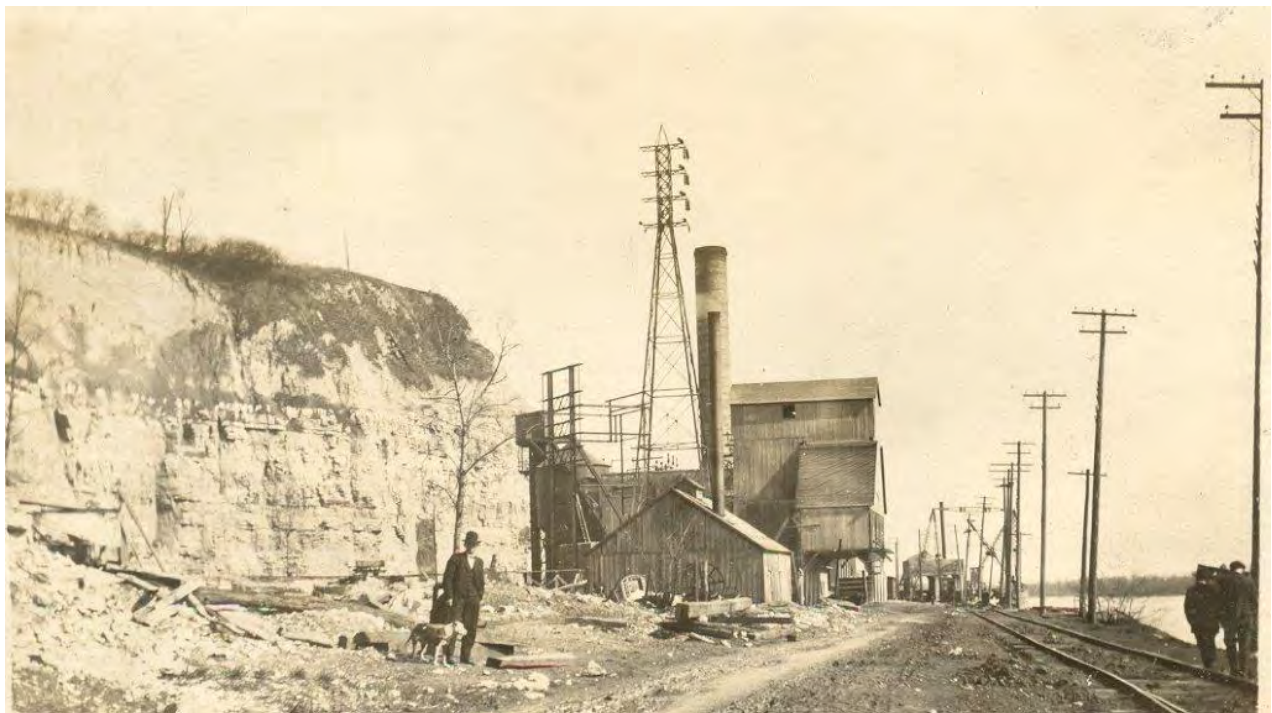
Site for power plant in 1914. Note railroad tracks and Mississippi River on the right. Photo courtesy of Robert Abbott.
